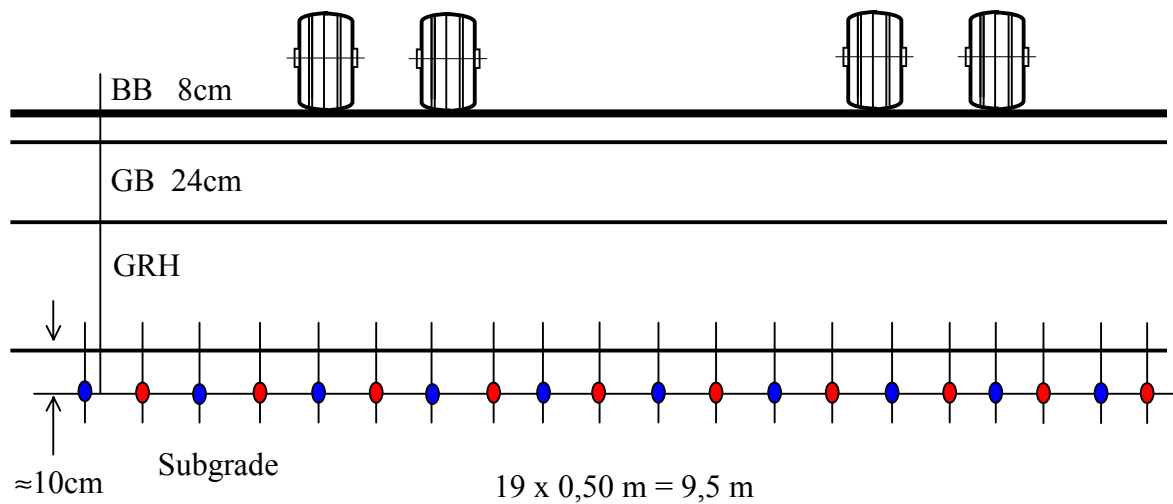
Alternated gauges location transversal profile on top subgrade (structures C & D).
